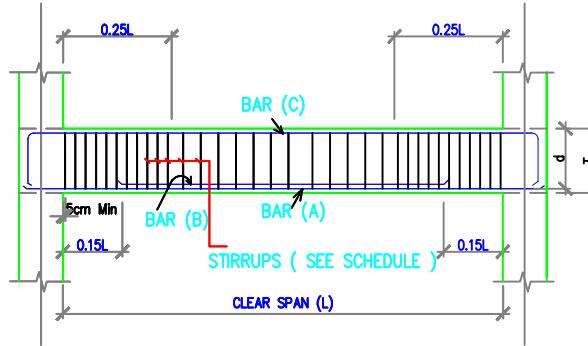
SINGLE SPAN BEAM SIMPLY SUPPORTED
